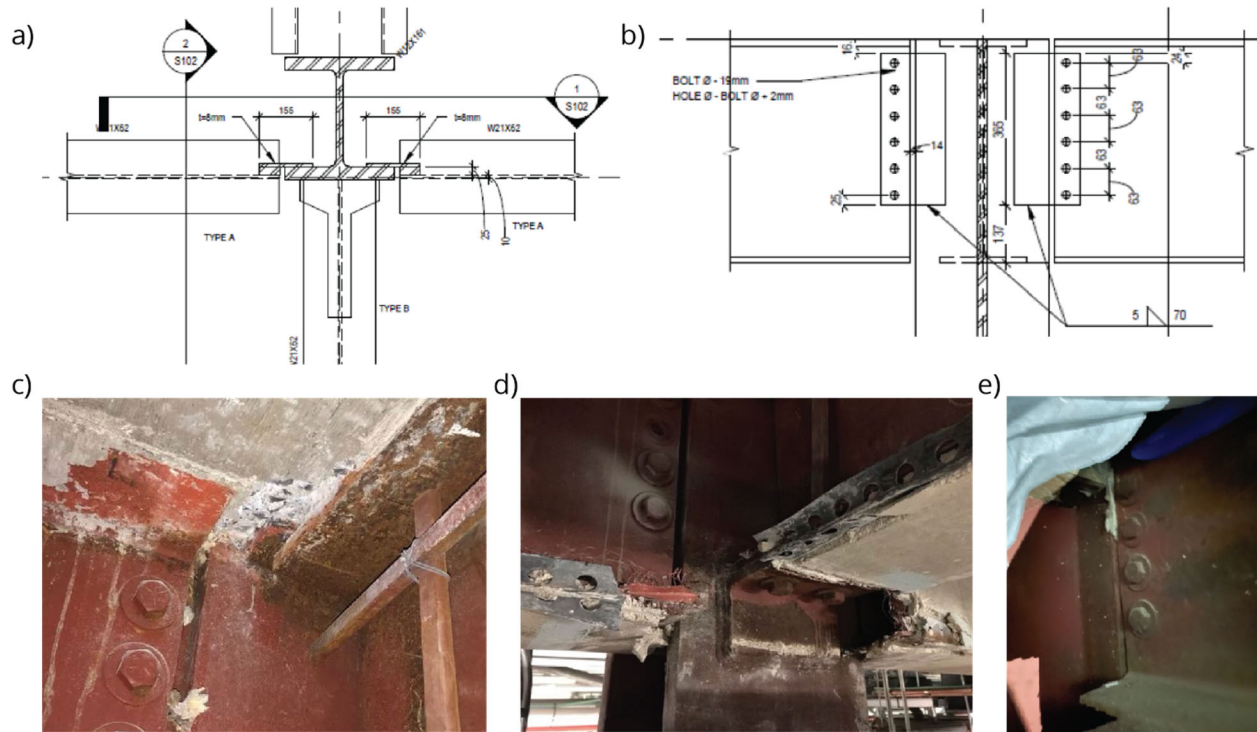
Beam column joint sketches and photos a) cover plate flange connection sketch b) typical shear tab connection sketch c) photo of cover plate connection d) photo of shear tab connection with seat angle e) photo of shear tab connection to column flange
